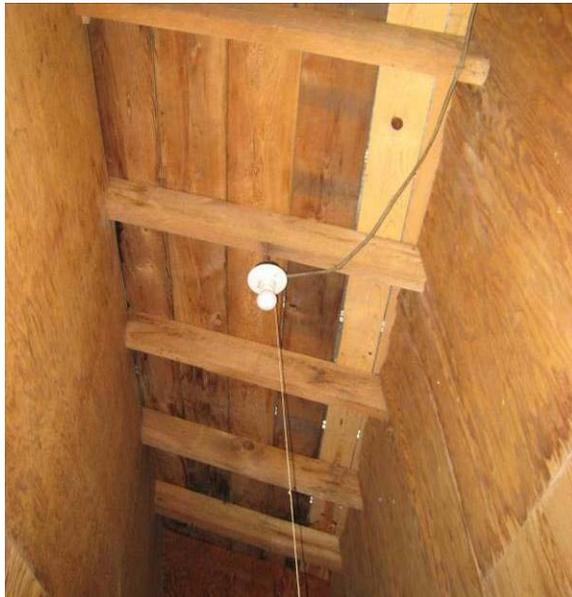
Exposed roof framing in Room 104D. Note replacement deck-board at the far right.
